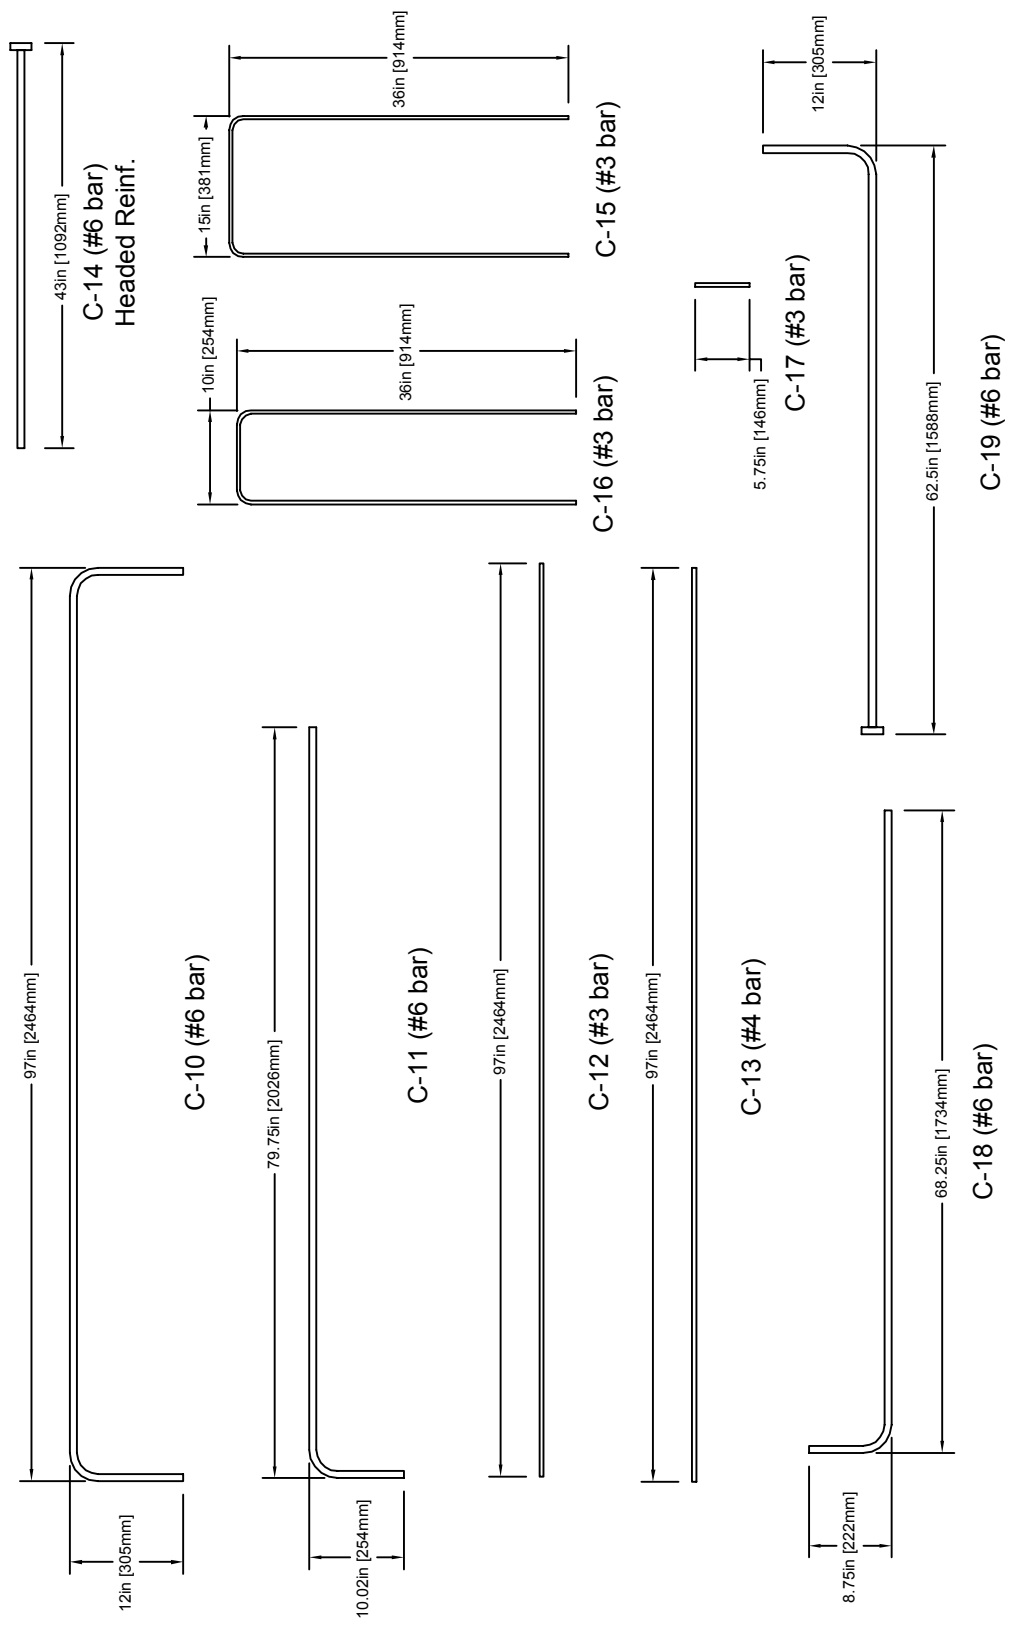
Bridge Plans Sheet 20; Steel Details 2.
